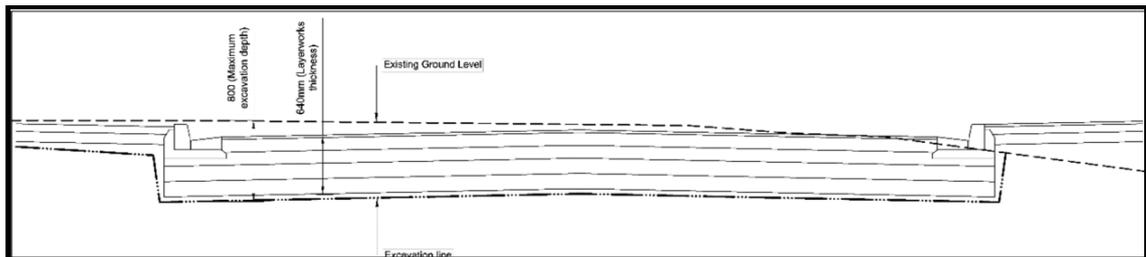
Excavation for road layerworks at depth (source: Walters, 2020)
